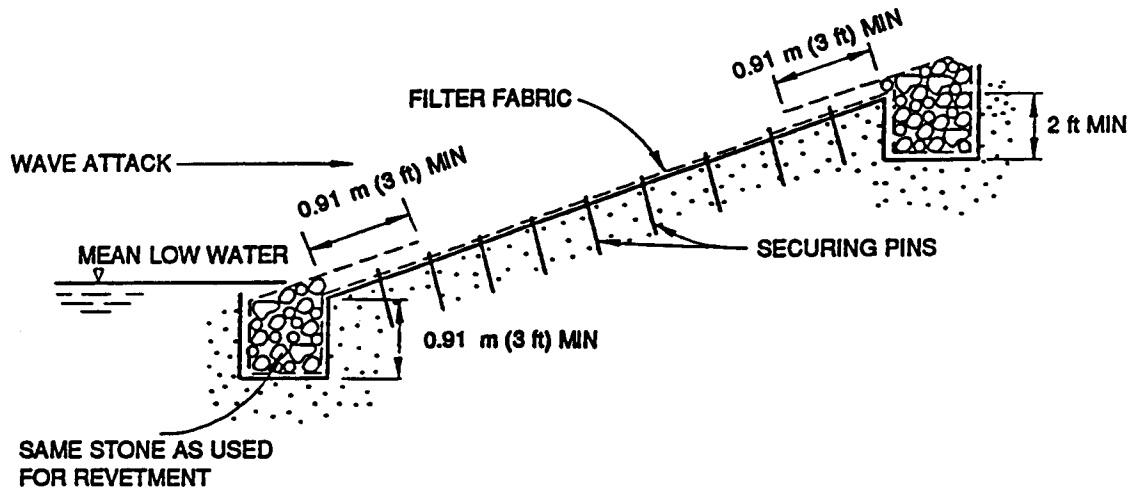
Filter fabric on bank subject to wave attack showing placement of vertical-wall key trench at toe and top bank. Revetment materials have not yet been placed on fabric.
